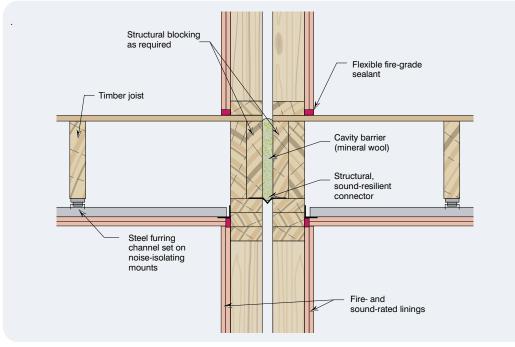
Discontinuous floor joist and floor sheeting – elevation view.
